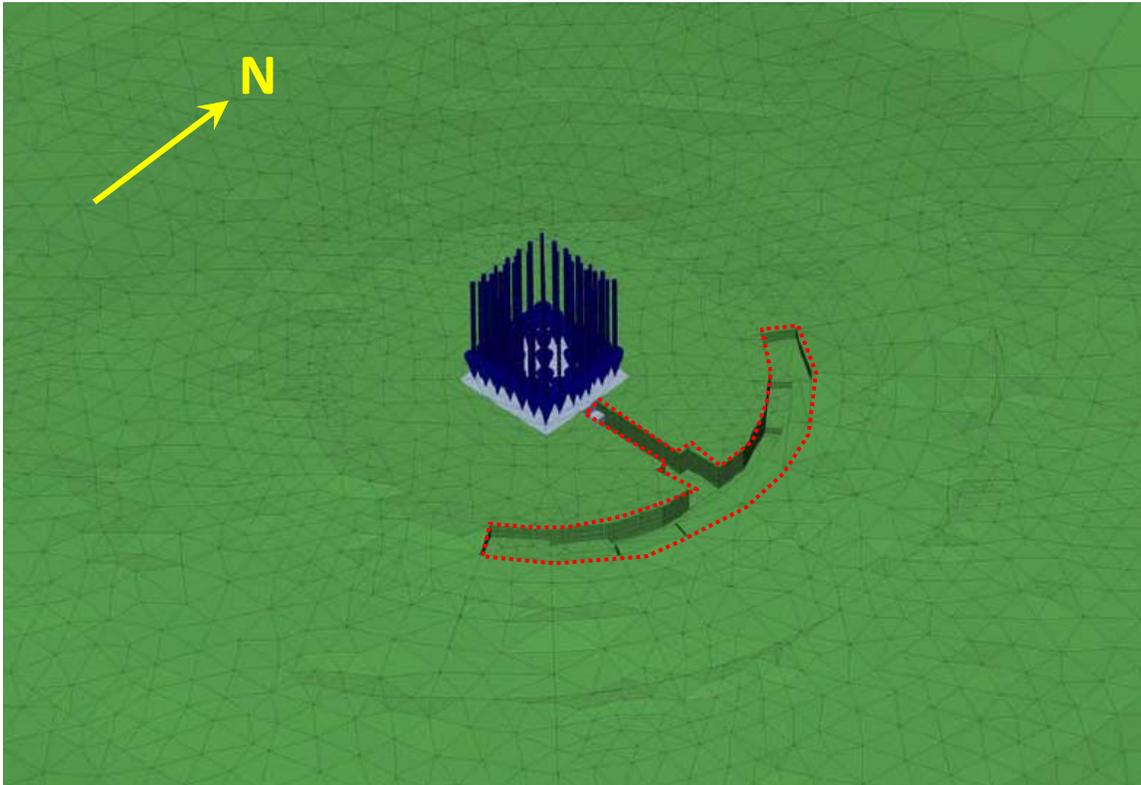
Excavation for Alternative A1: tunnel and recessed entrance.
